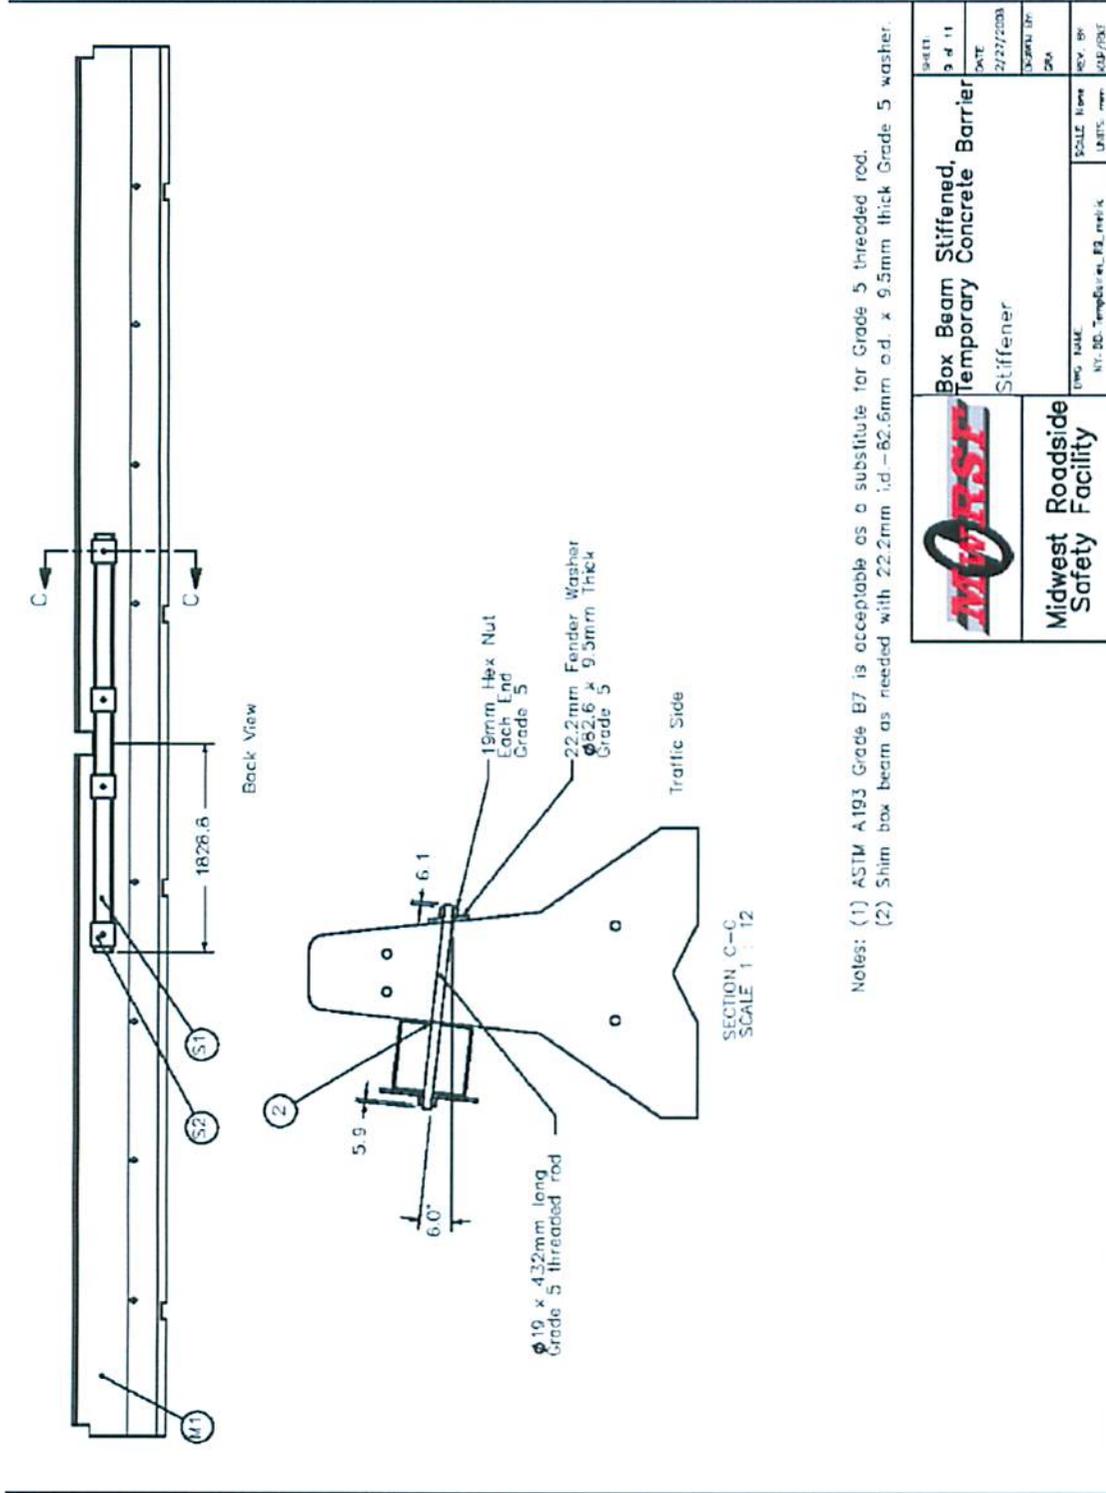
Box Beam Stiffener Details, Test NYTCB-1
